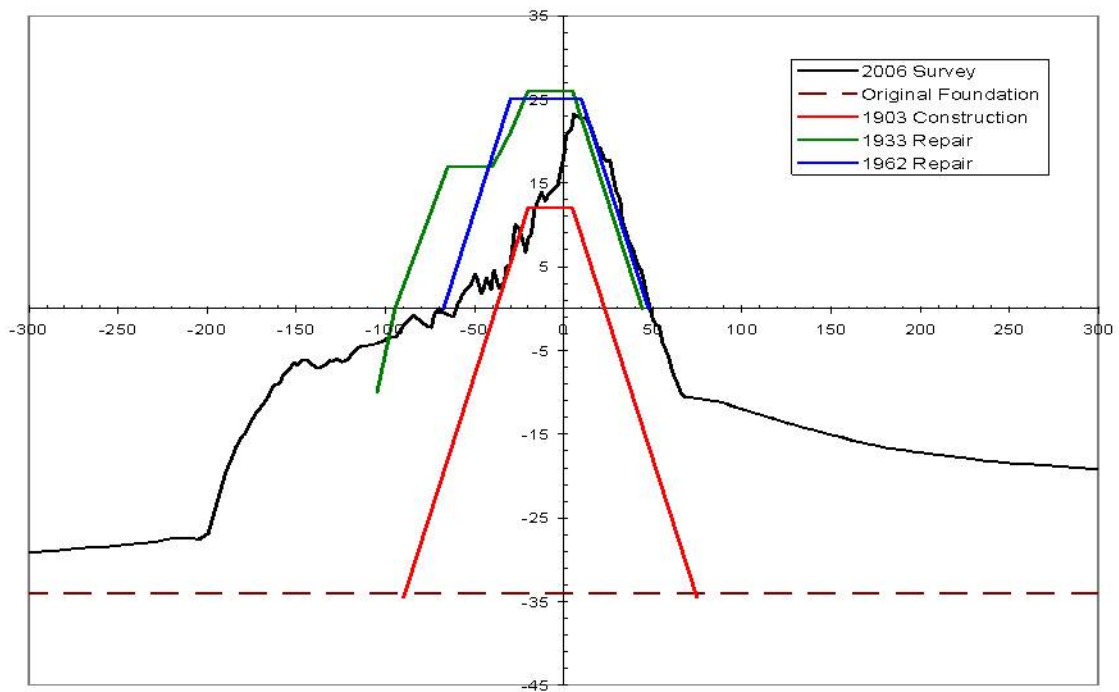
131. South Jetty Cross Section Templates - Trunk
